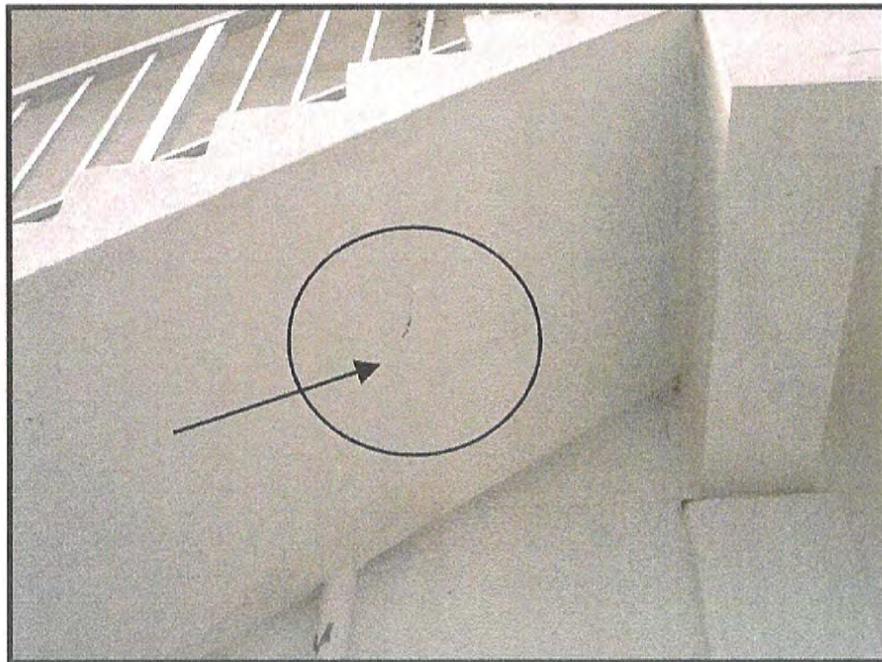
Delaminated Areas along bottom face of top stair run for North exterior stair.
